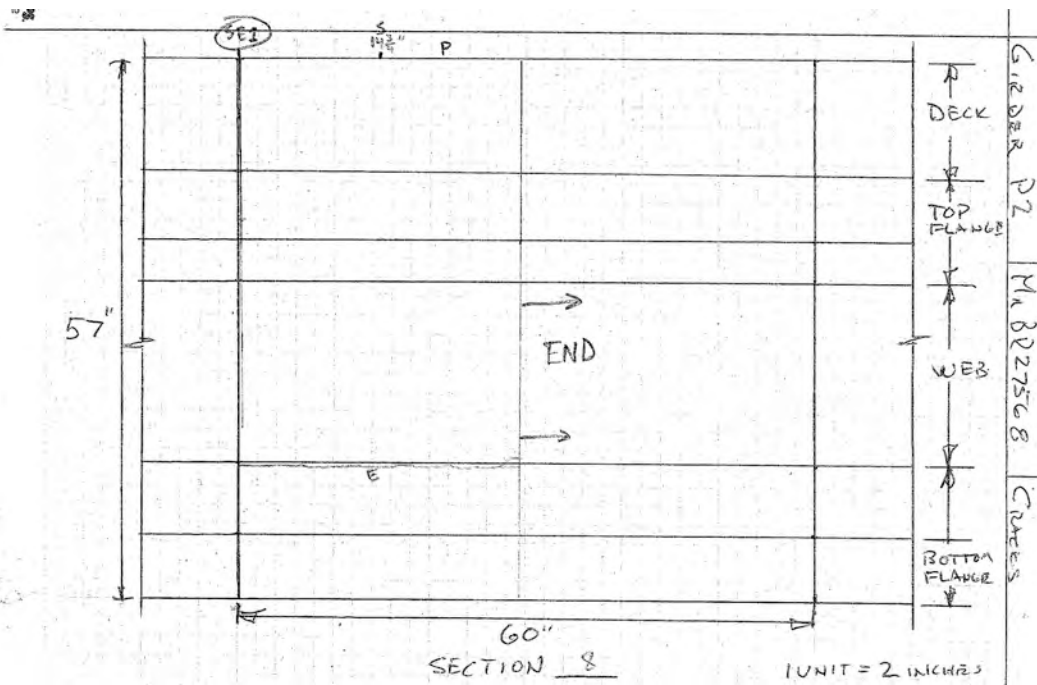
Girder P2 crack pattern – Section 8
